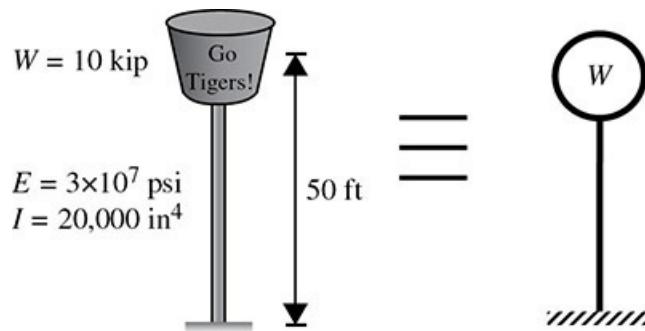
Water tank supported on a slender column and the idealized structural model.
